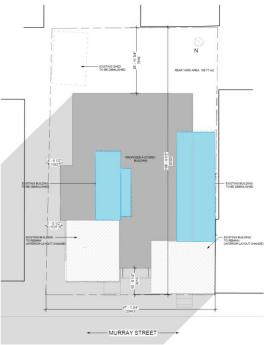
& 10: A view from the rear yard of 168 Murray Street Illustrate the context and relationship to 162 Murray. The turquoise indicates the portion of the two buildings that will be removed to construct the apartment shown in dark grey with the two houses shown in white. Source: Red Line Architecture 2022.
